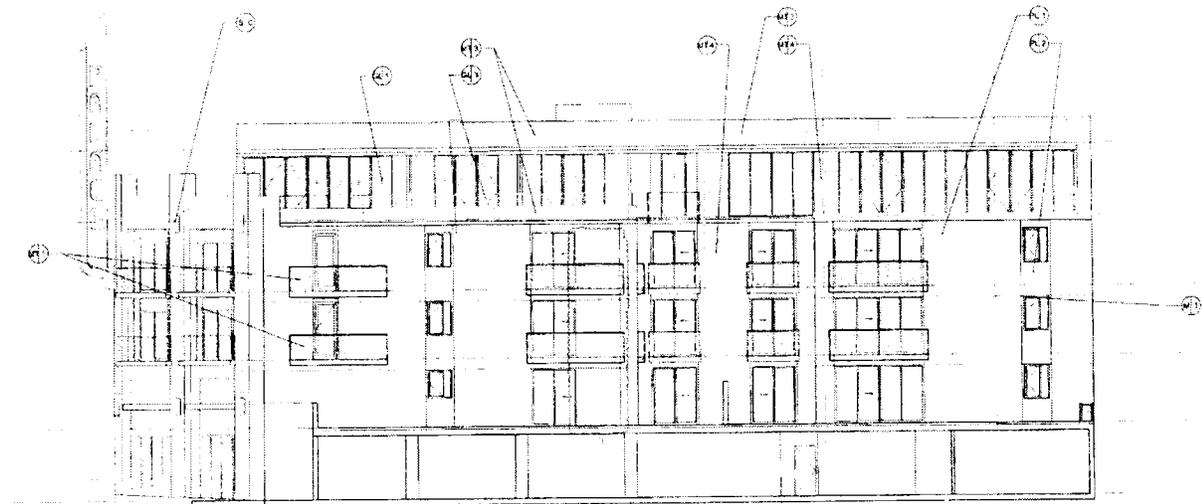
PROPOSED 1731 POWELL ST NORTH (FILBERT STREET) ELEVATION
